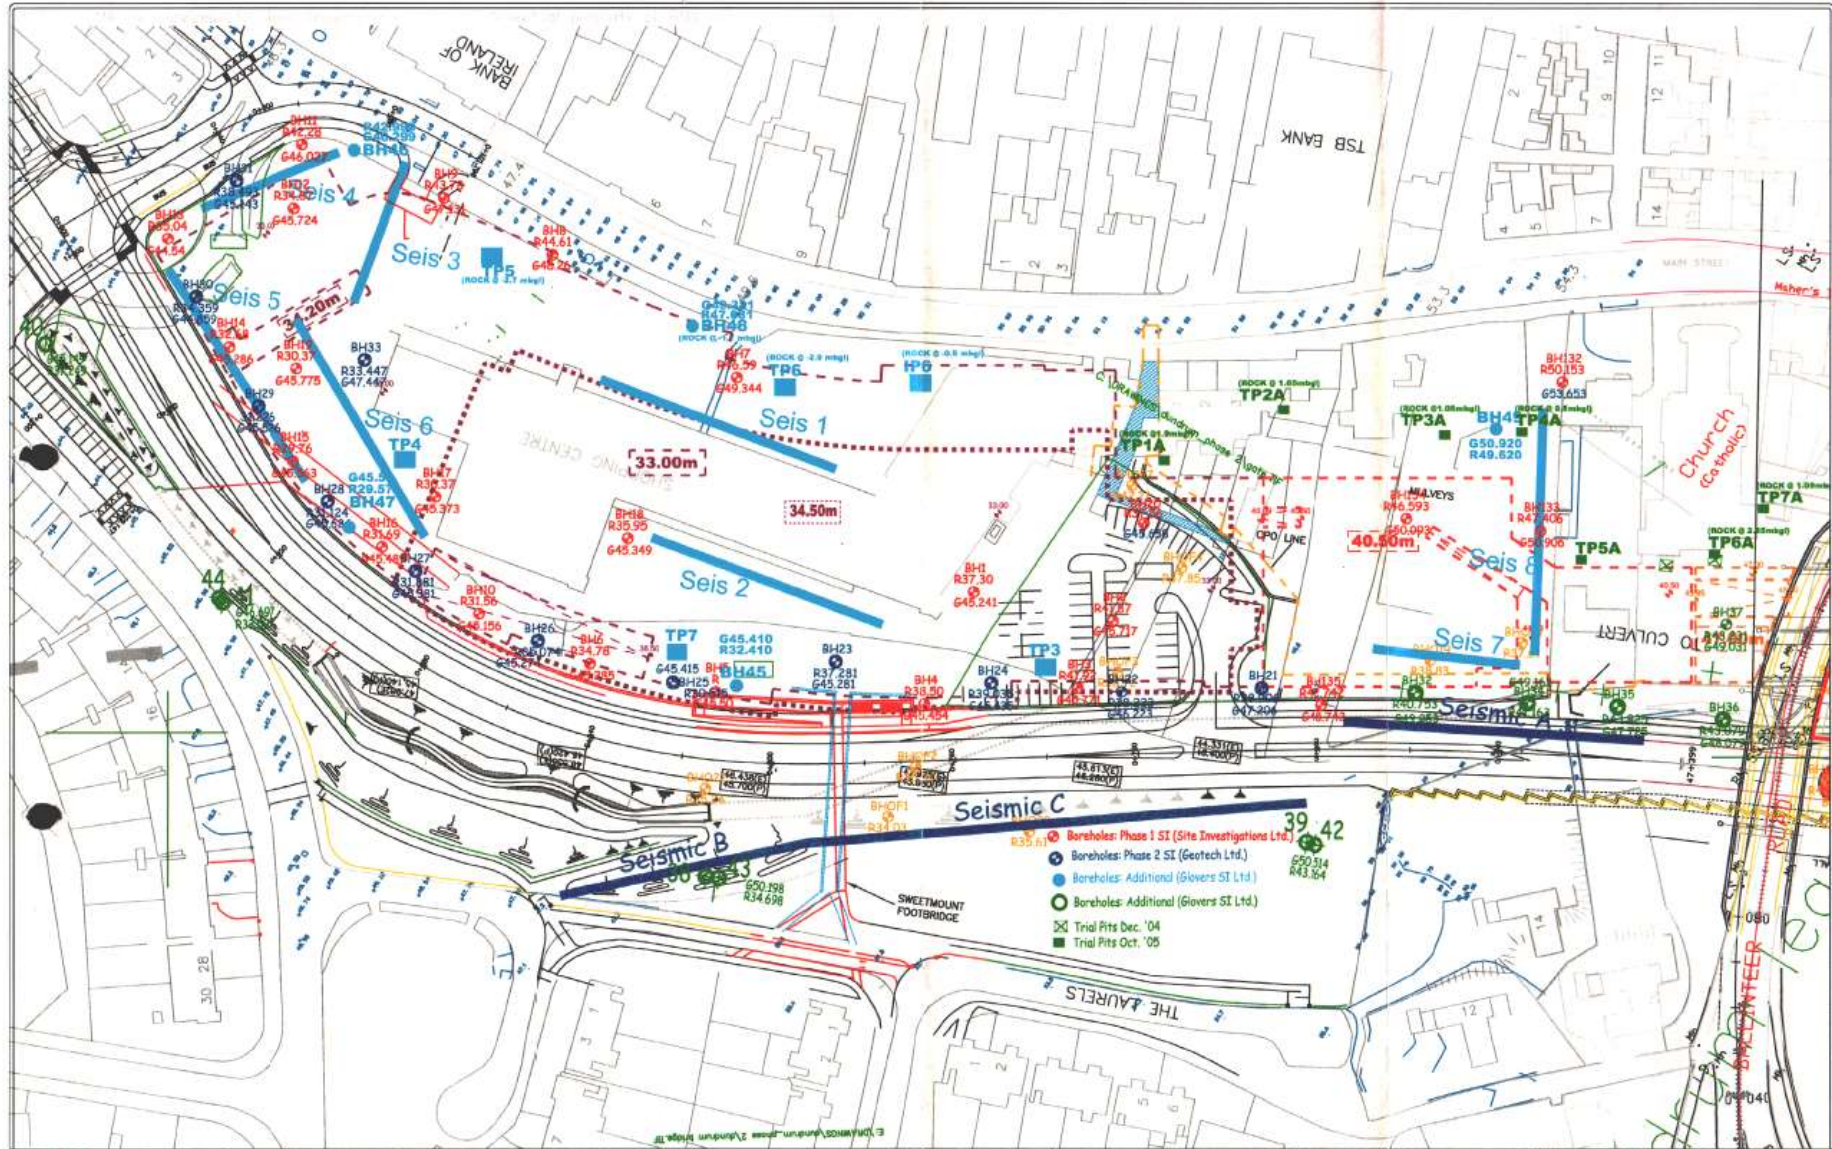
SI location plan showing 8 No. out of 11 No. seismic refraction profiles (2006 BMA Report)
